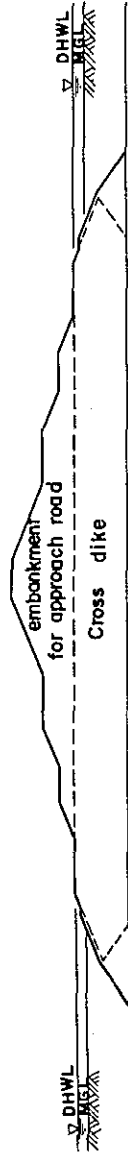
Standard Cross Section of Cross Dike (Scale 1/500)
